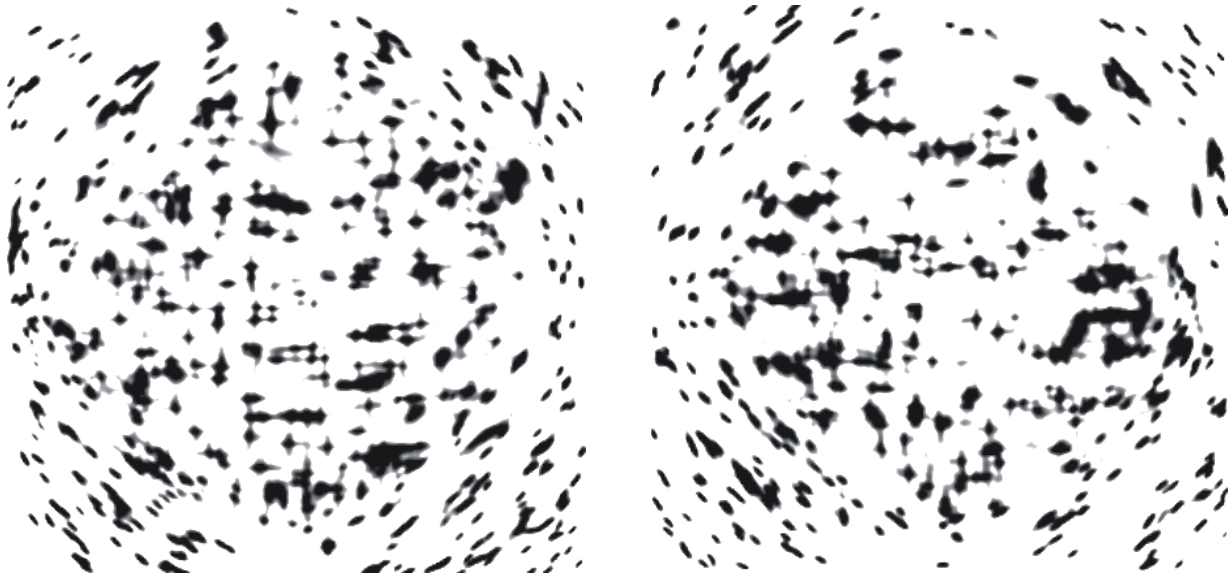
The 2D images of sections of concrete C4 beams located at 100 mm and 200 mm from its surface
